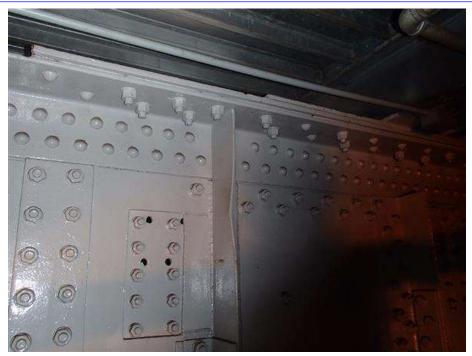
Photo Taken: 12/23/2015 West elevation of floorbeam FB22W in span 3. Note the mis-drilled holes and bent vertical stiffener.
